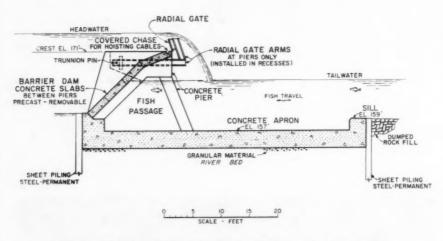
TYPICAL CROSS SECTION OF BARRIER DAM AND APRON
